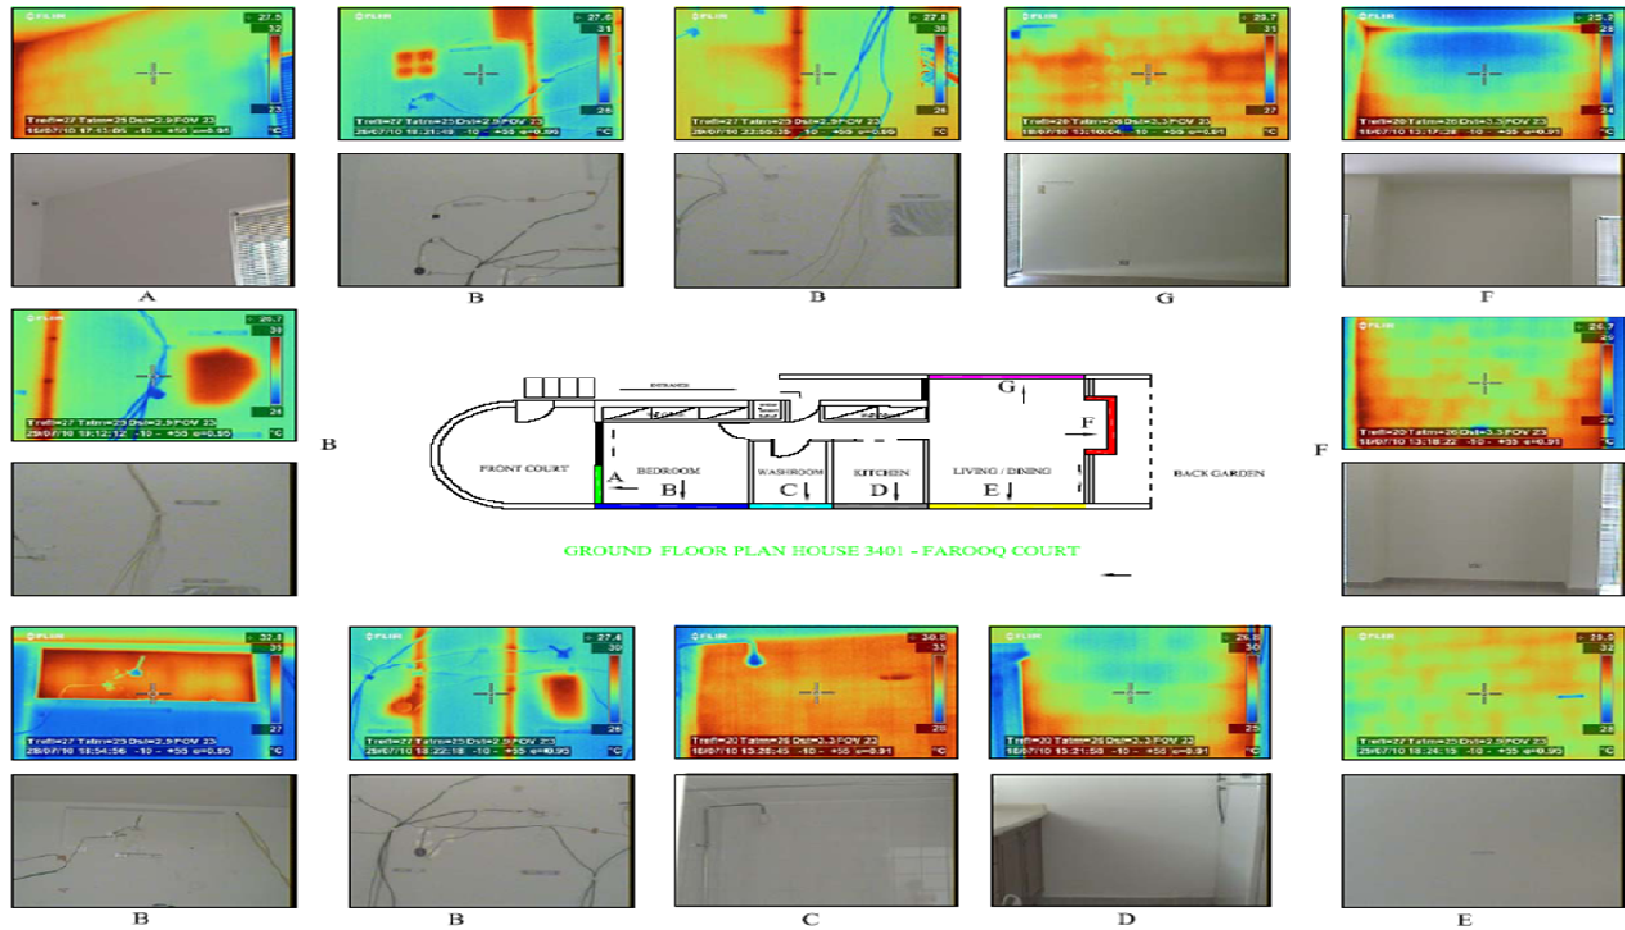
Building Layout - Illustrating the thermal images of each wall
